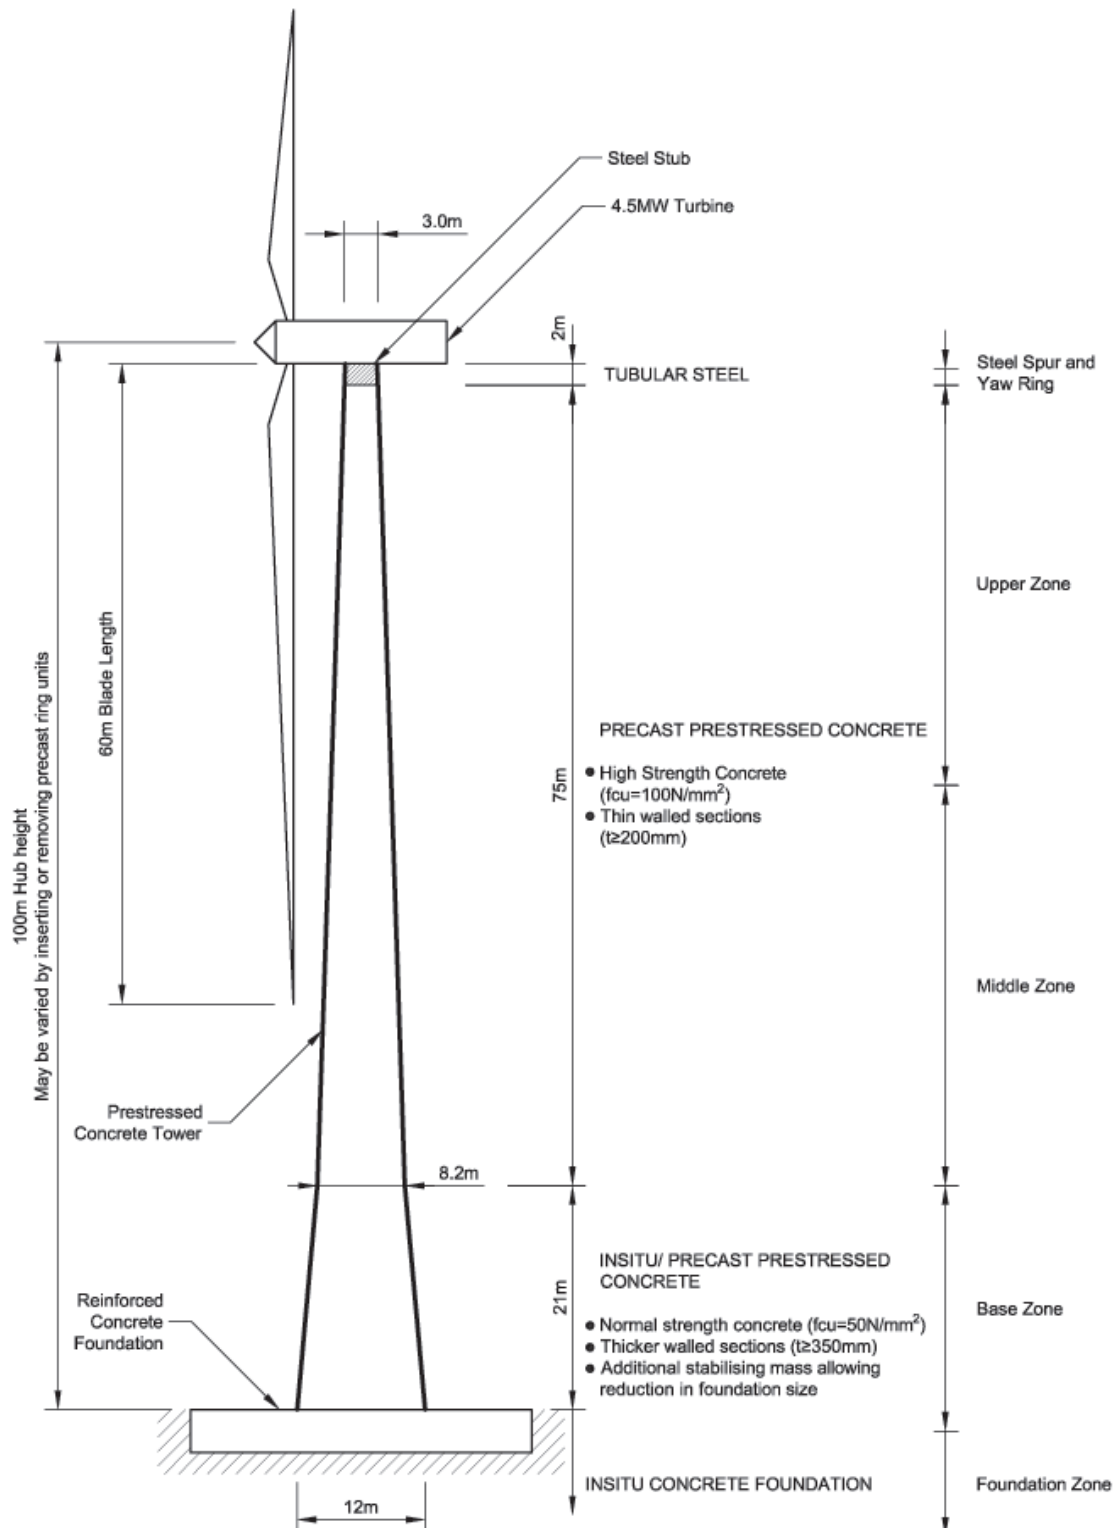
The Concrete Center 328ft concrete tower. (The Concrete Center, 2007)
